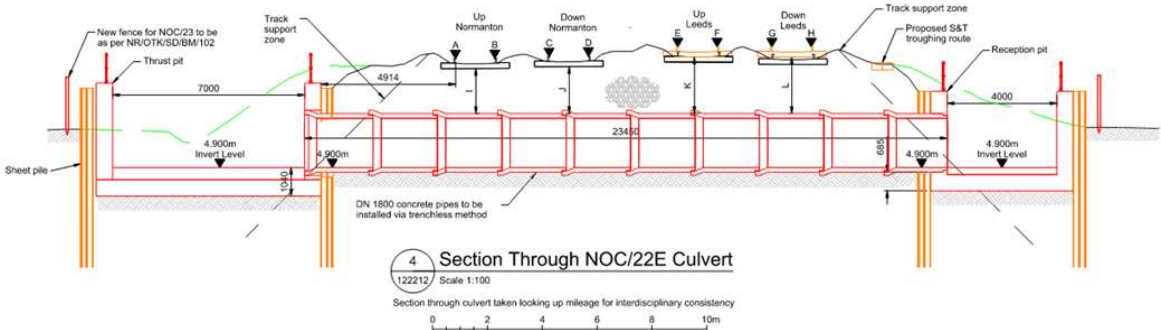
Extract of cross section, showing one of the proposed culverts (NOC/22E), against natural ground levels and existing embankment setting
